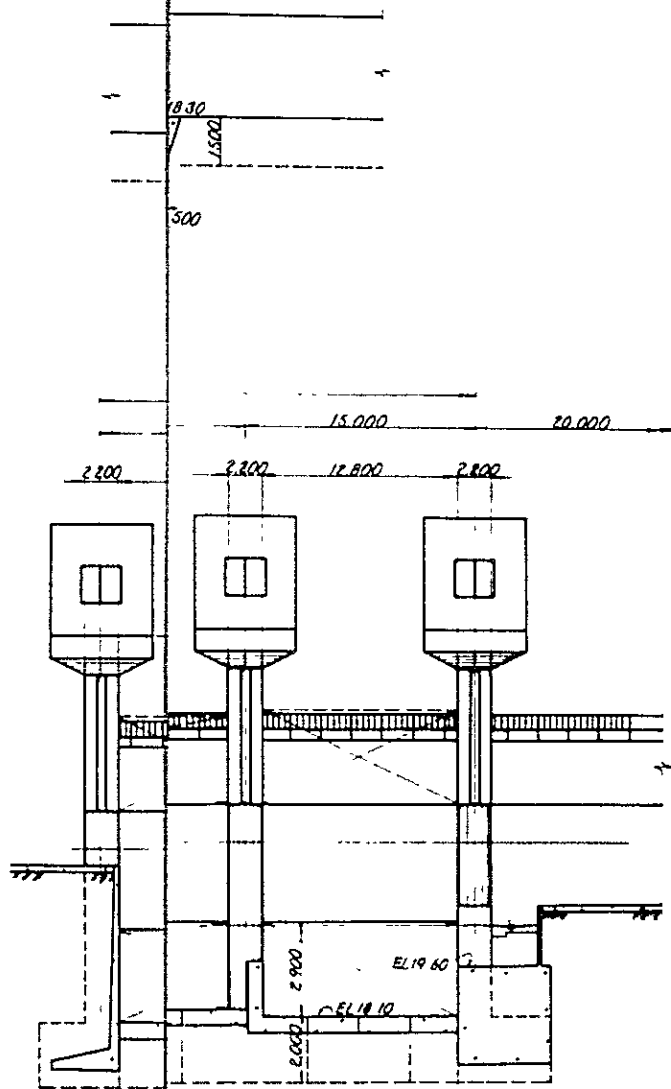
TYPICAL CROSS SECTION OF DAM
